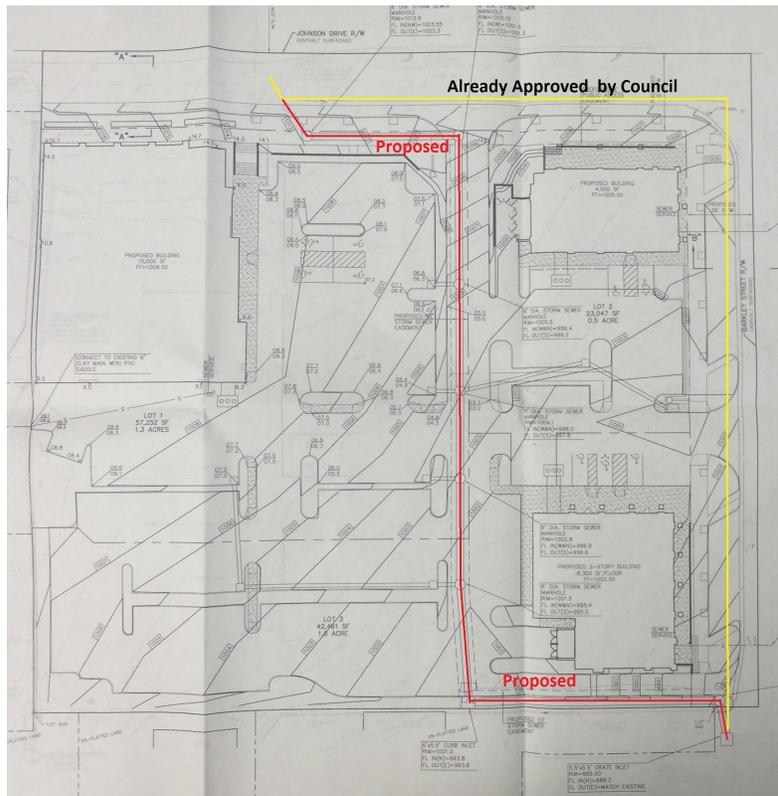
DETAILS: The Cornerstone Commons project at the former Keystone dealership has begun demolition and construction is imminent.
